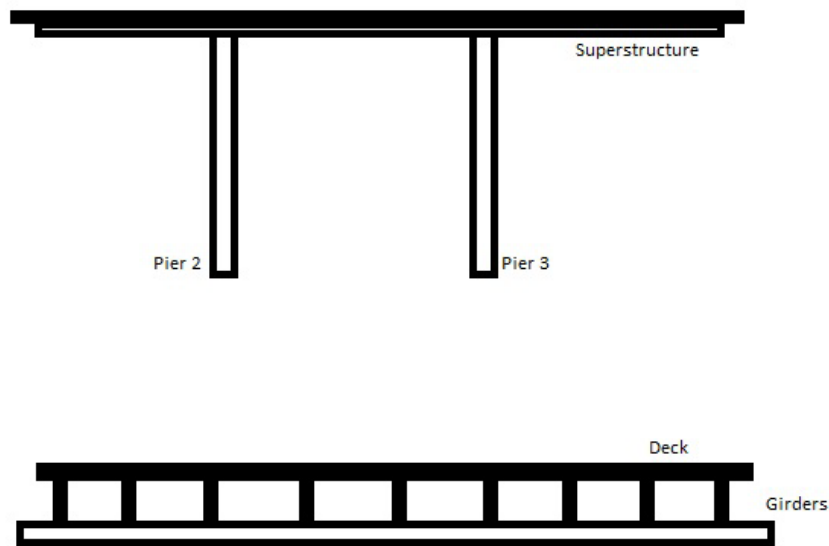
Representative plan for the Highway Bridge, elevation and cross-sectional views, from [1]
